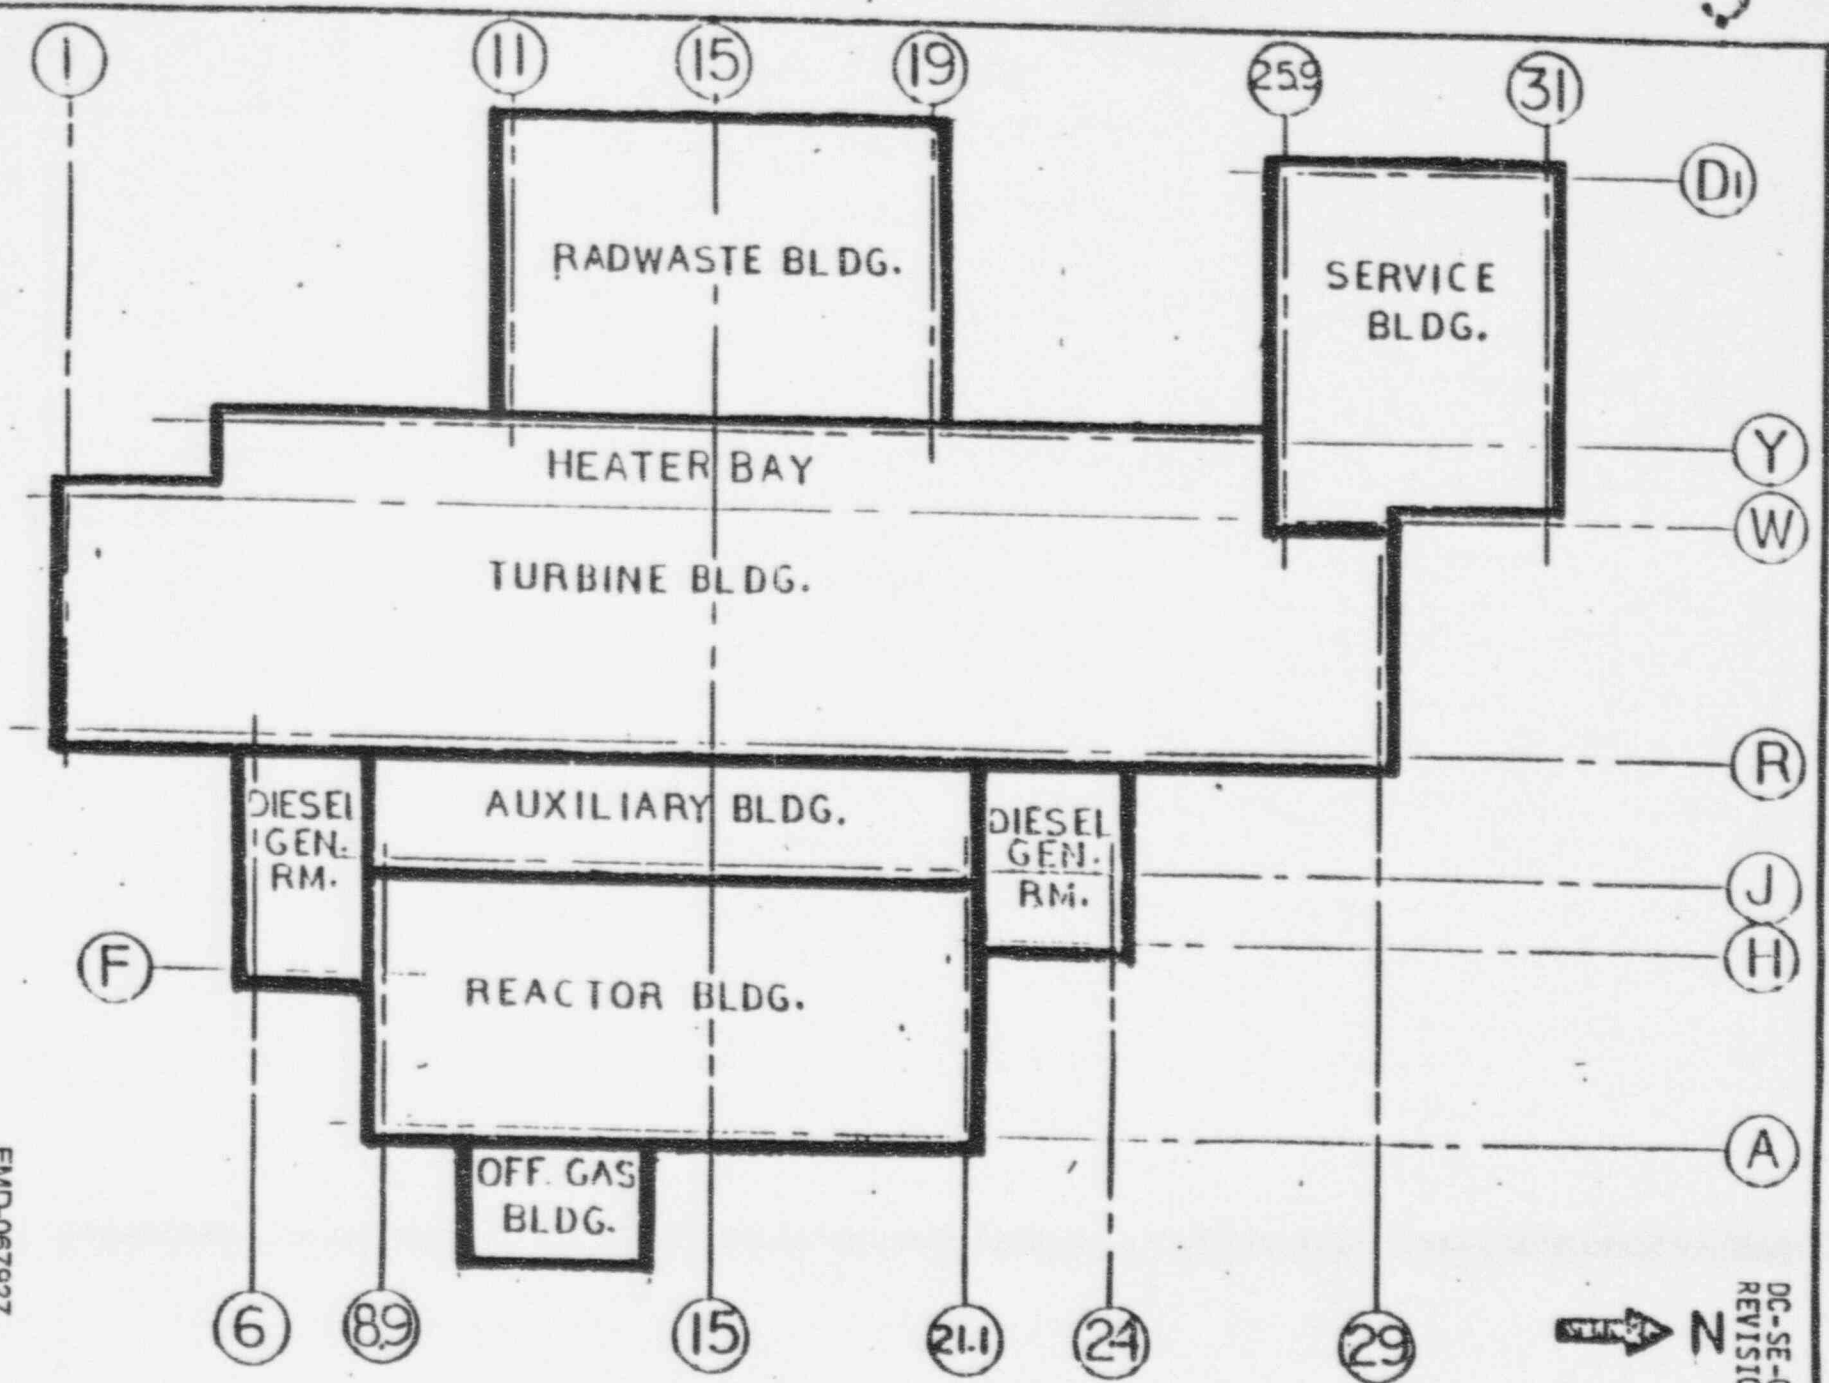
KEY PLAN FOR LA SALLE COUNTY STATION
